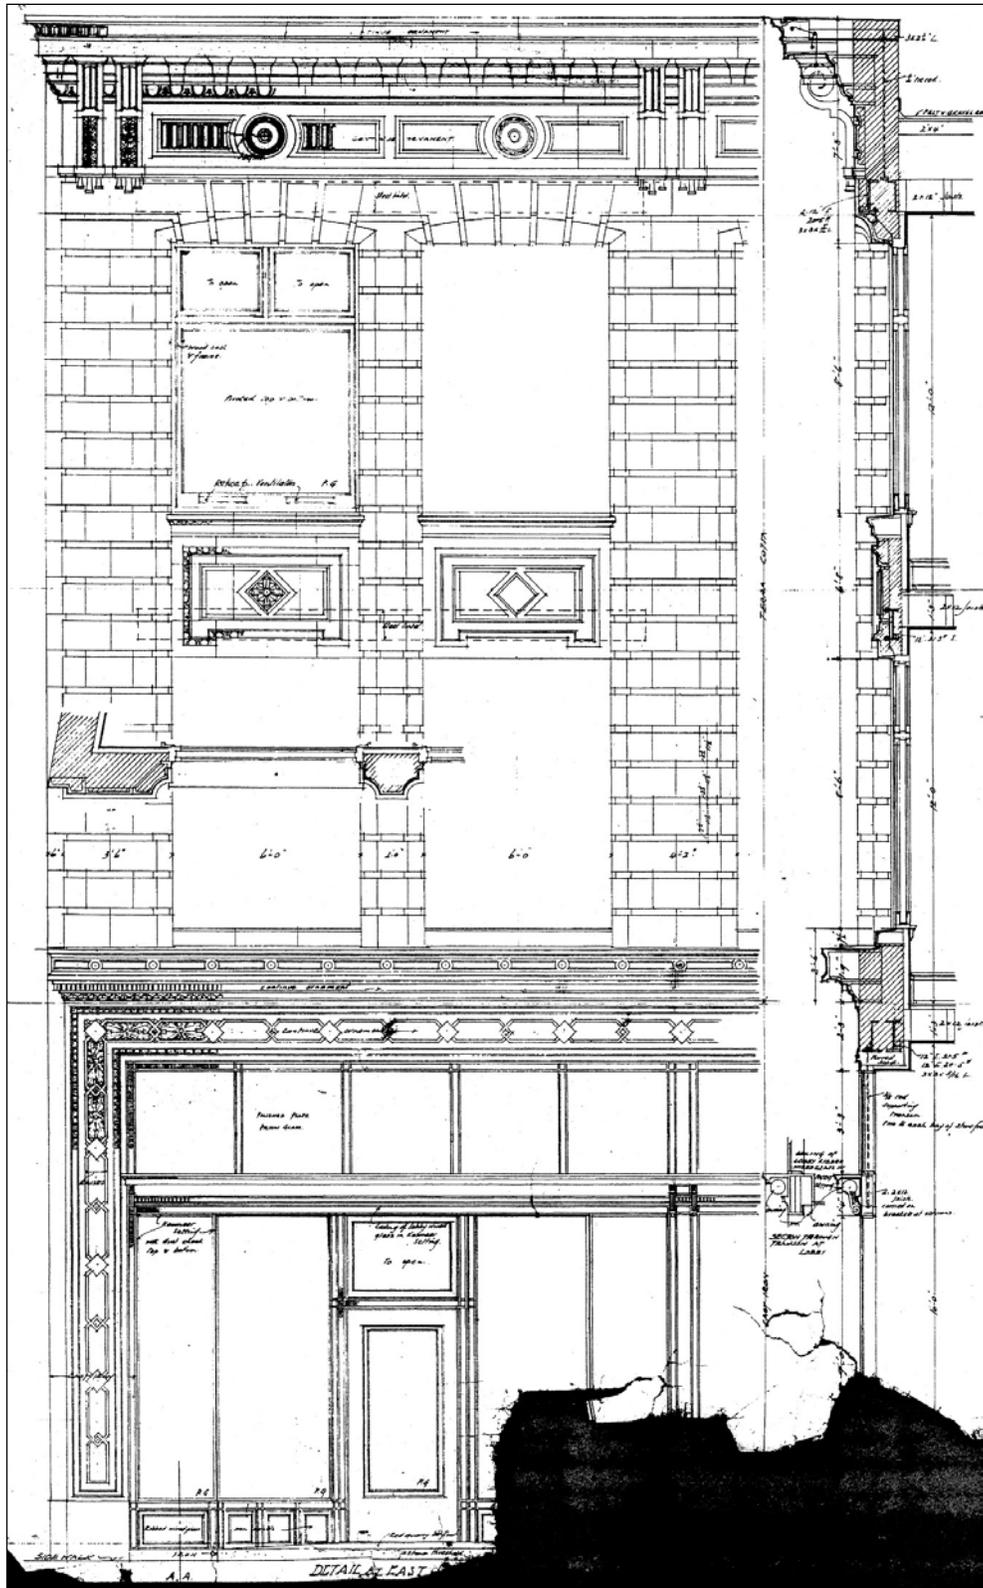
Architect’s plans, detail of one of the Portage Avenue entrances, 1912. (Courtesy of City Archives, Plan #1399/1912.)
